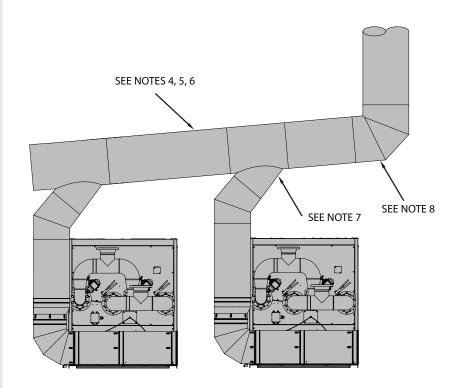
TYPICAL COMMON FLUE GAS EXHAUST VENT LAYOUT
